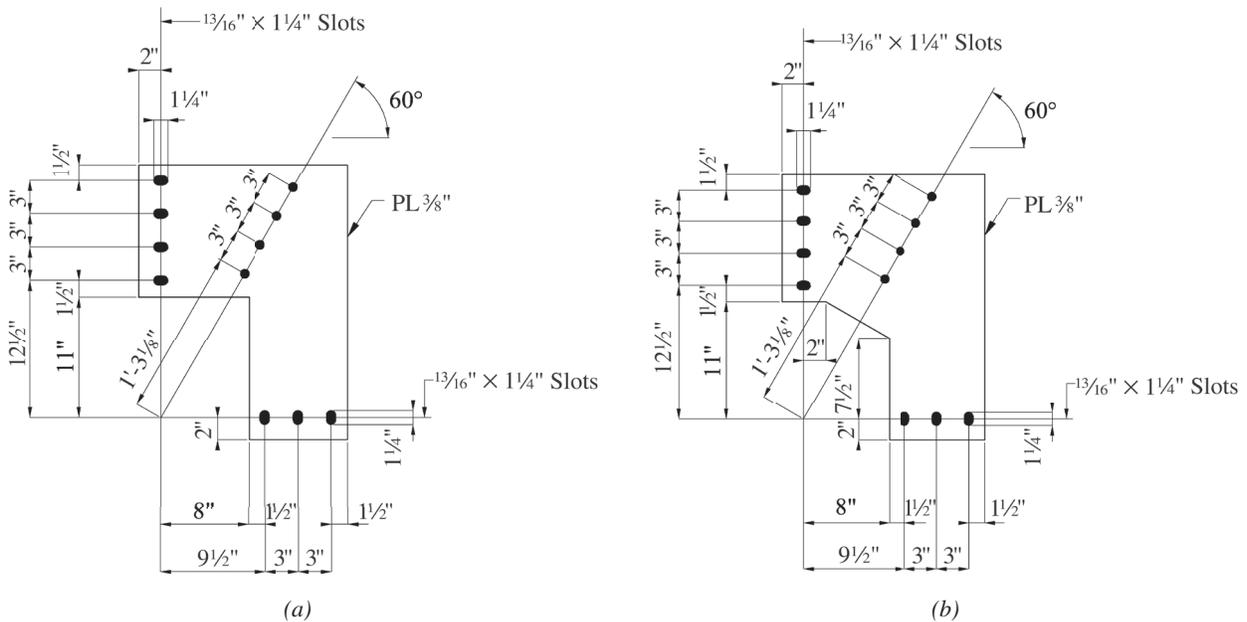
Details of specimens 8 and 10: (a) specimen 8; (b) specimen 10.
